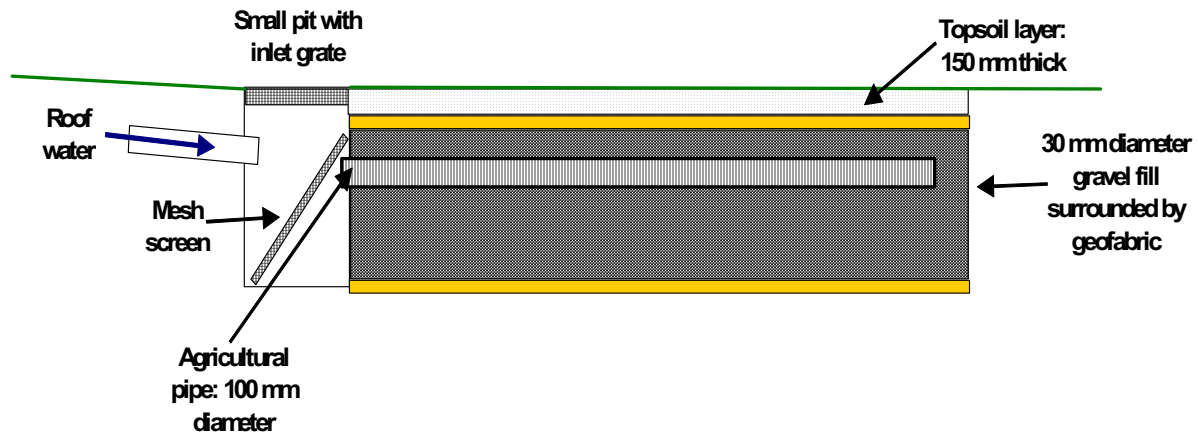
Details of an infiltration trench used to capture roof water on allotments
